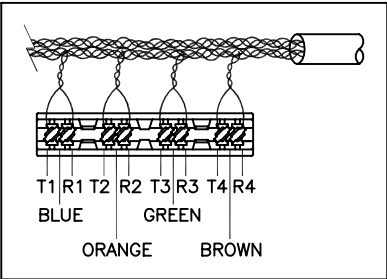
TOP VIEW OF A 4–PAIR 110C4 CAT6 CONNECTING BLOCK
